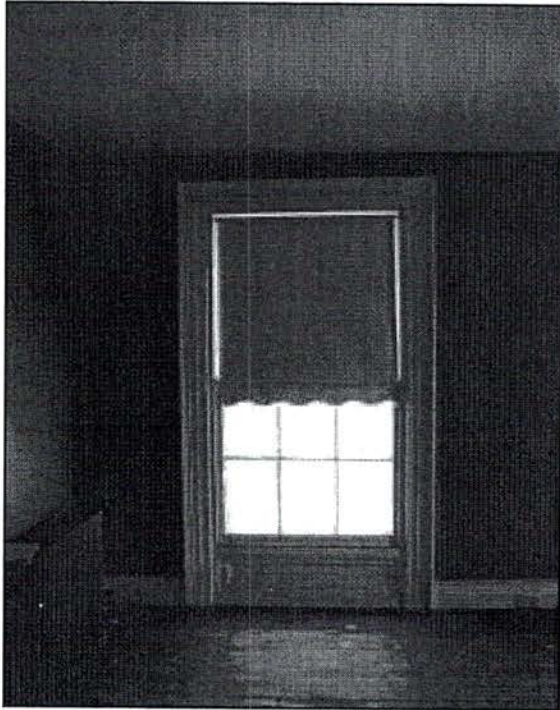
Detail of the south wall in Room 202 showing window moldings. All windows in the east facing rooms have wood skirts.
